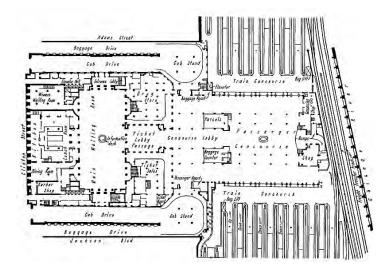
Station Level Plan of the Headhouse and Concourse. https://chicagology.com/1920buildings/unionstation/
